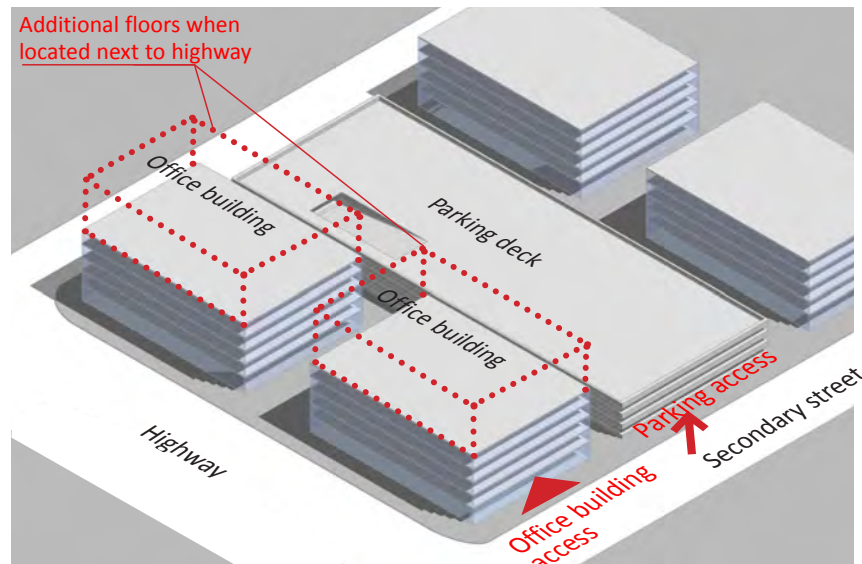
3D illustration of office and parking arrangement on development parcels close to the highway
